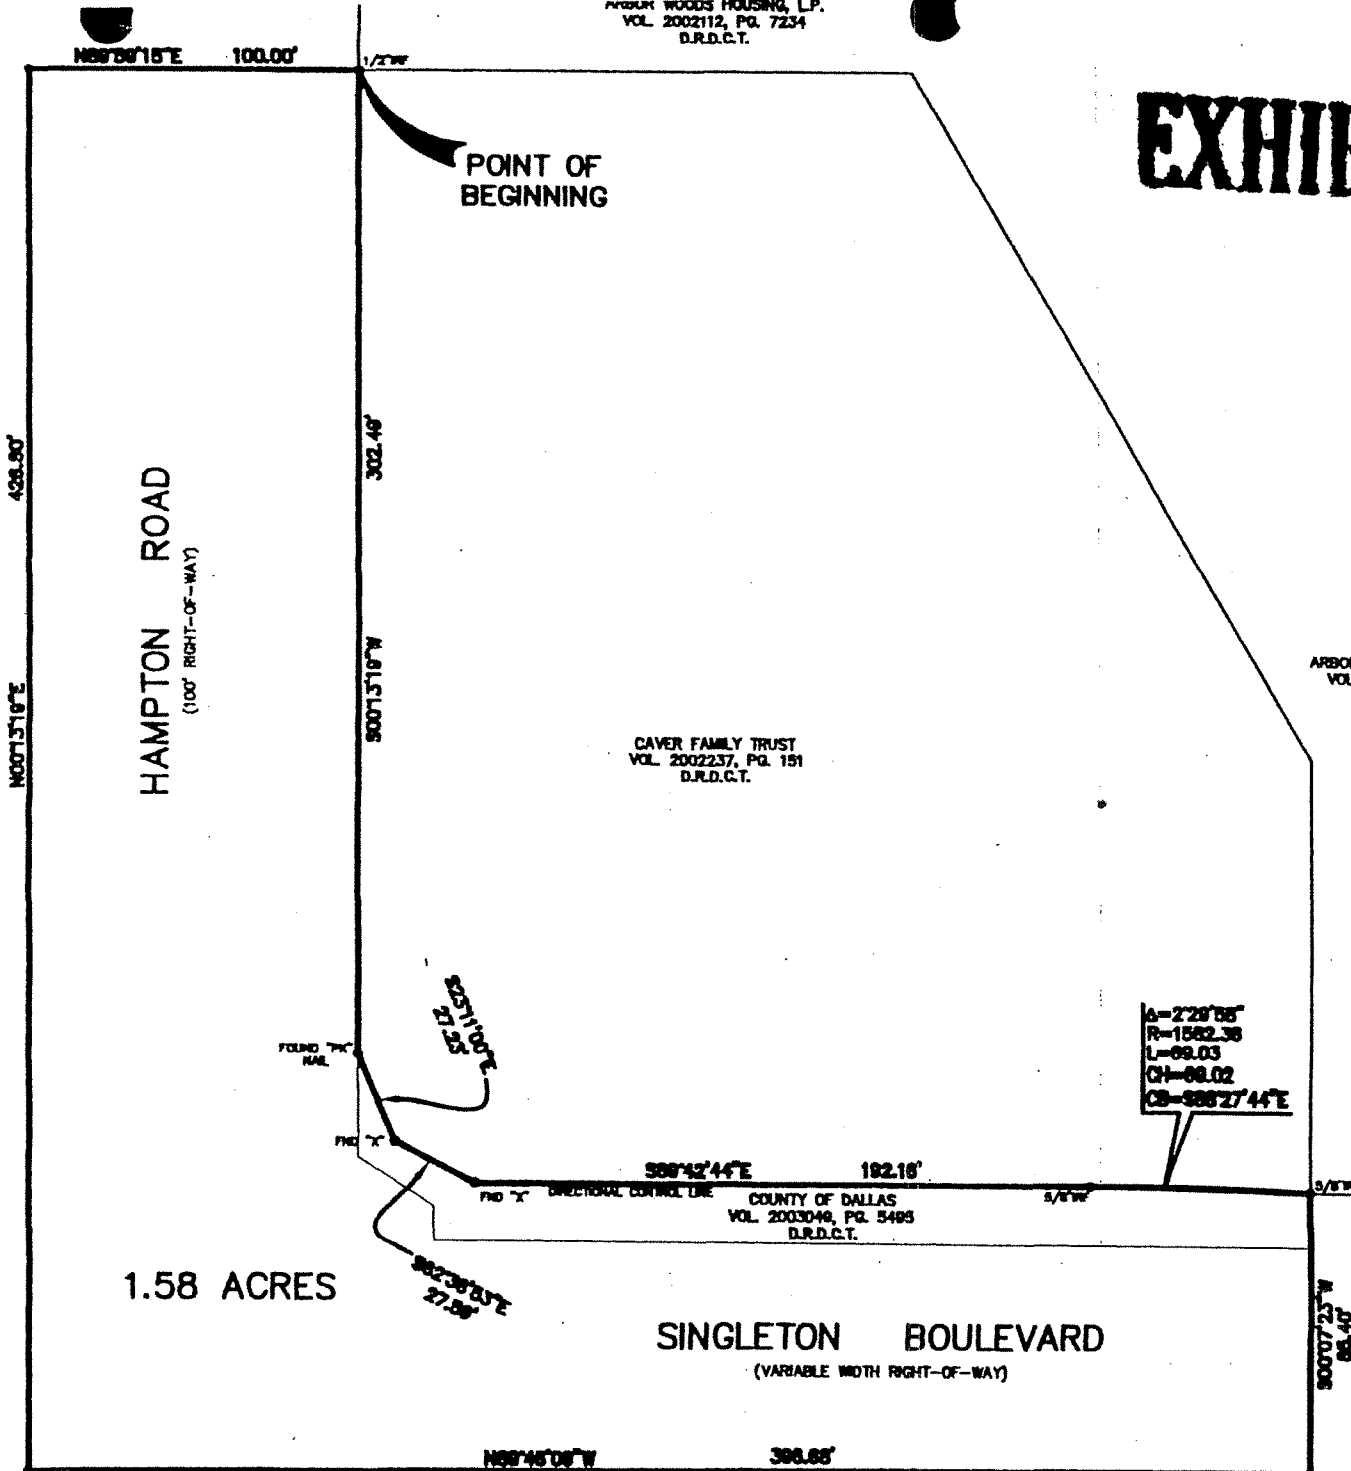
EXHIBIT HAMPTON ROAD & SINGLETON BOULEVARD
